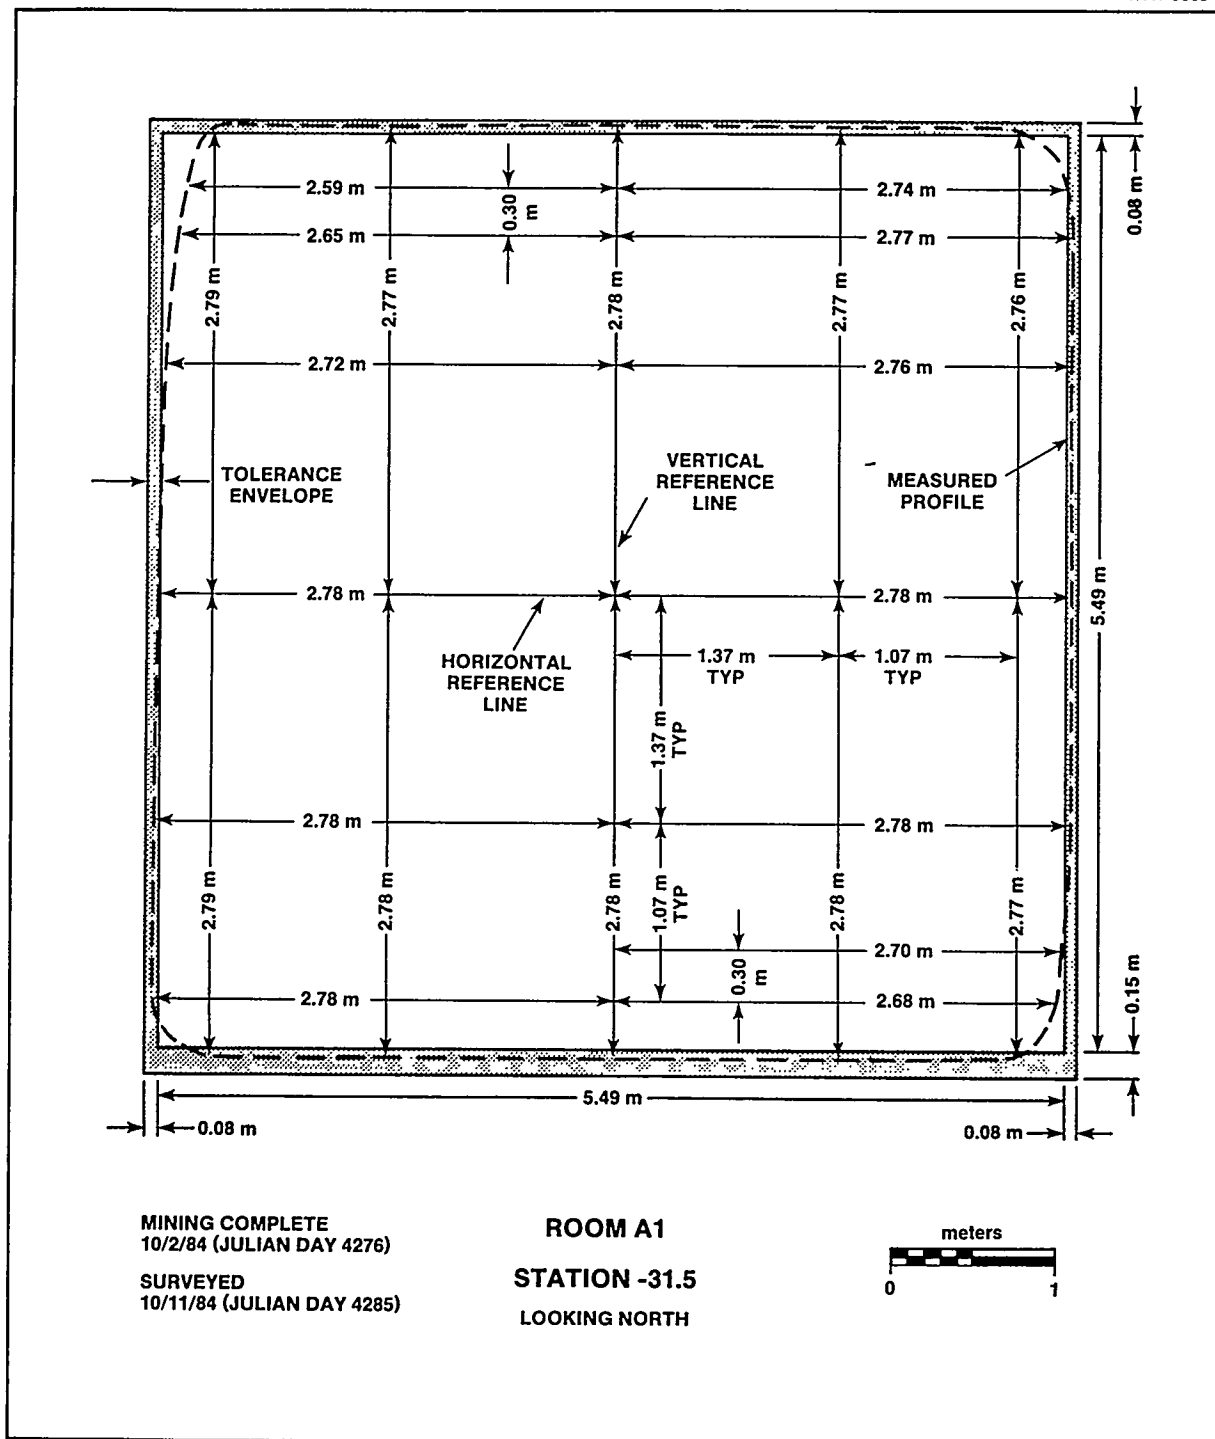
As-Built Cross Section of Station -31.5 m, Room A1
